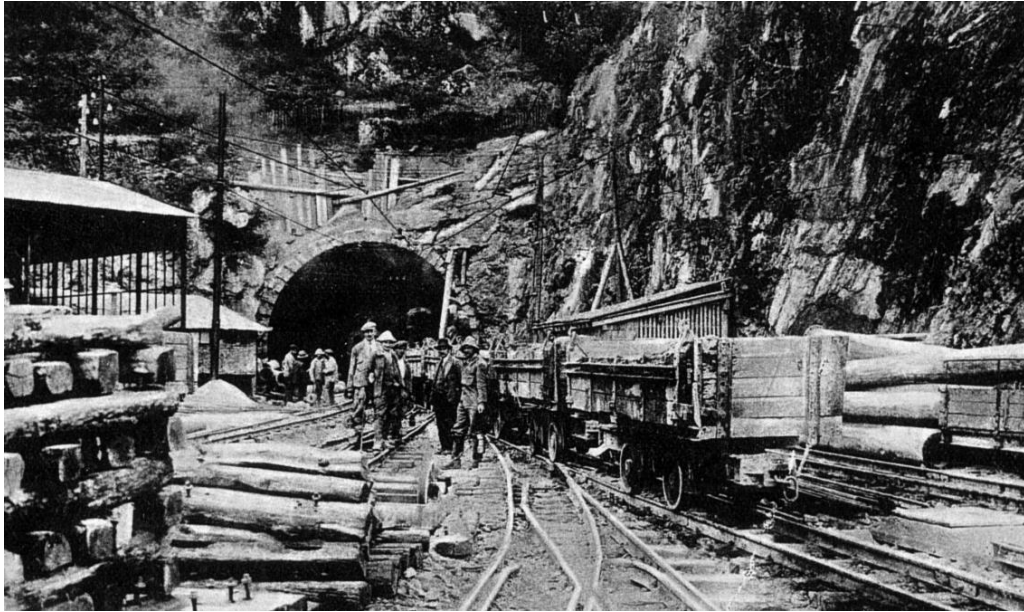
<sup>th</sup> July 1933. Train loaded with wood pieces for timbering works inside the tunnel.
